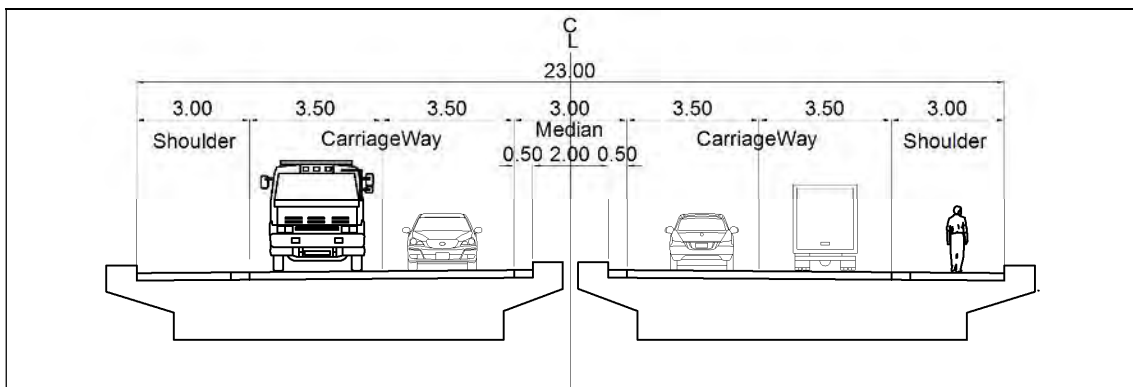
Typical Cross Section of Bridge of RR3
